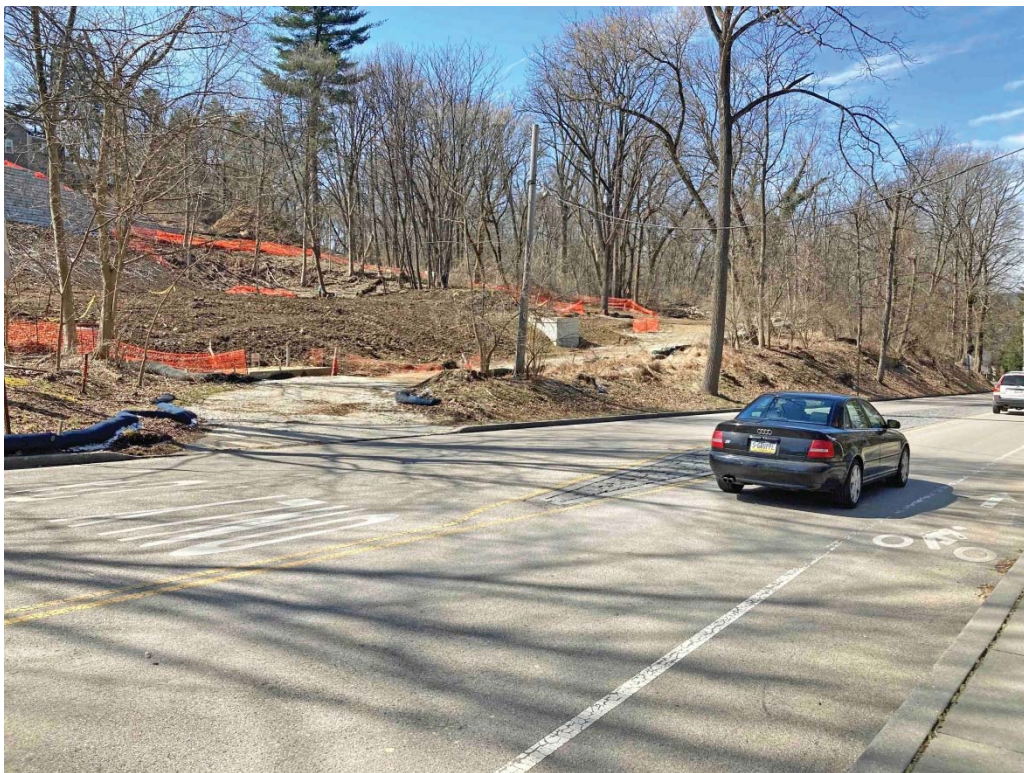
New Entrance at intersection of Germantown and Hillcrest Avenues looking south.
